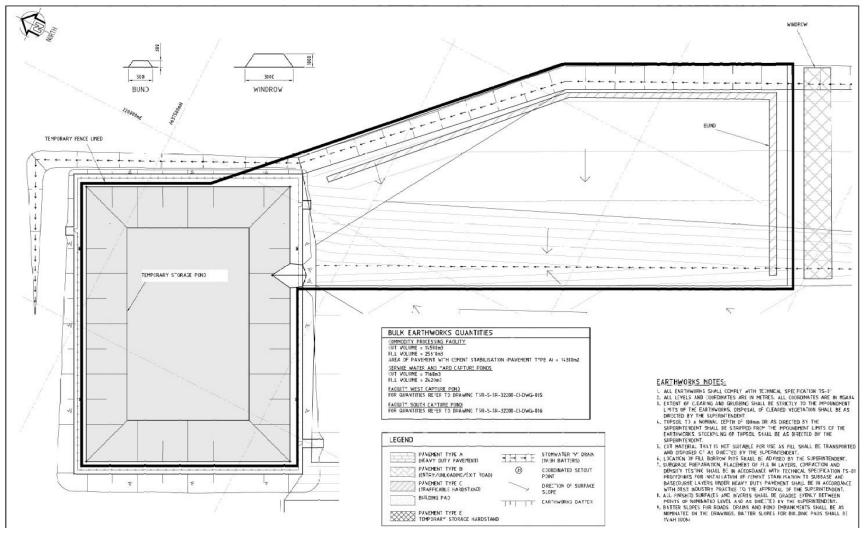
Temporary Waste Storage Area – drainage and bunding detail Figure provided by the Applicant
